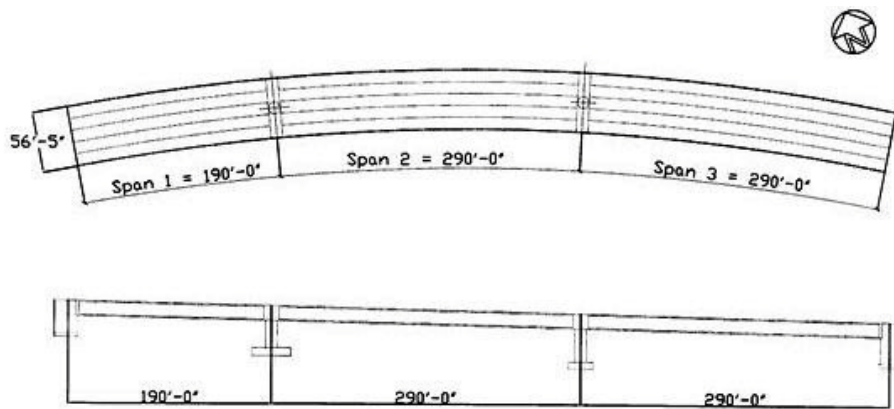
Plan and Elevation of Post-Tensioned Box-Girder Bridge
